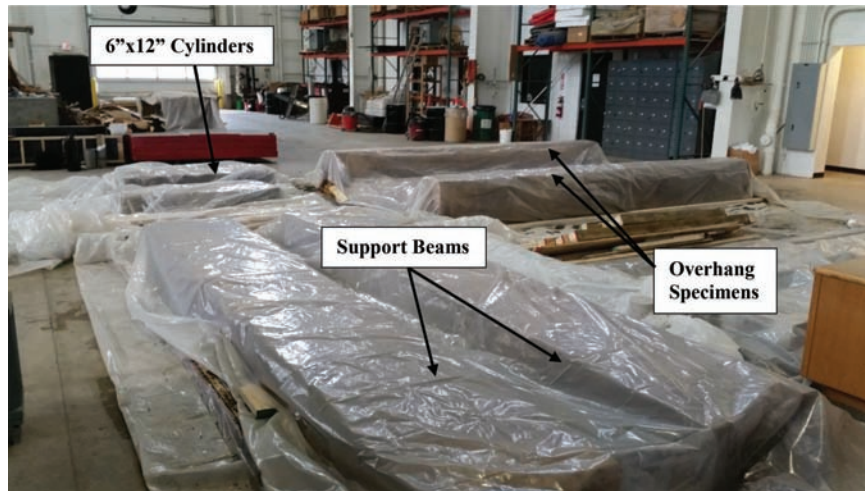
Concrete curing area (Specimens 1 and 2).
